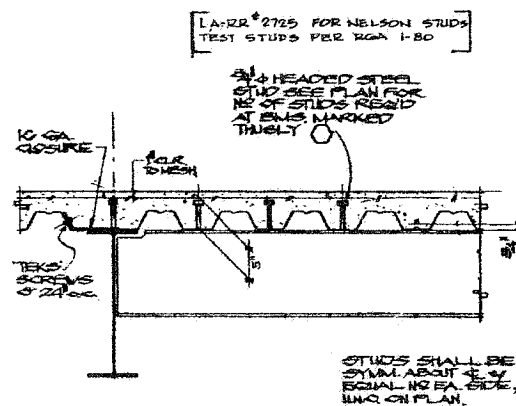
Floor diagram detail along with the beam where the slab is connected
